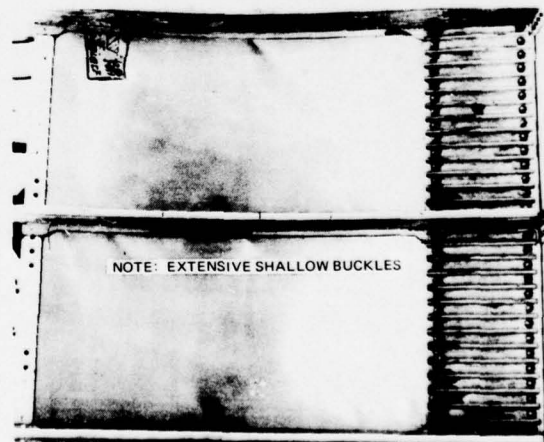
SHEAR AND COMPRESSION FAILURE - BACK VIEW
